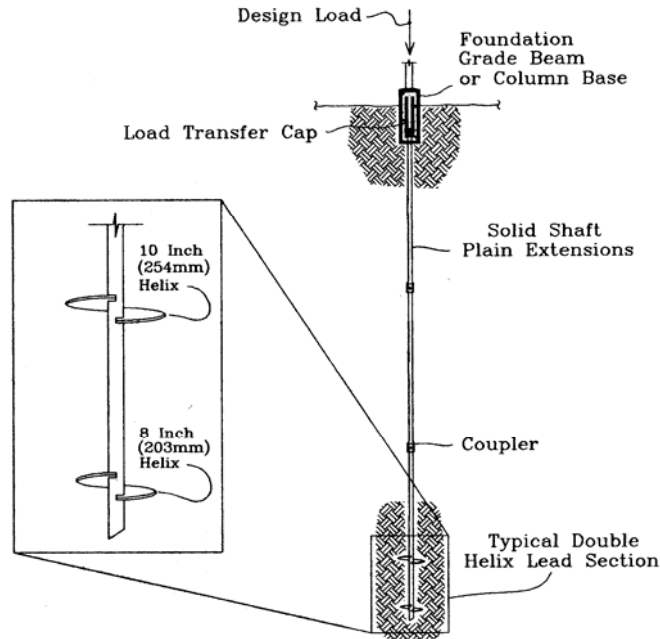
Double helix helical pile supporting a foundation grade beam.
